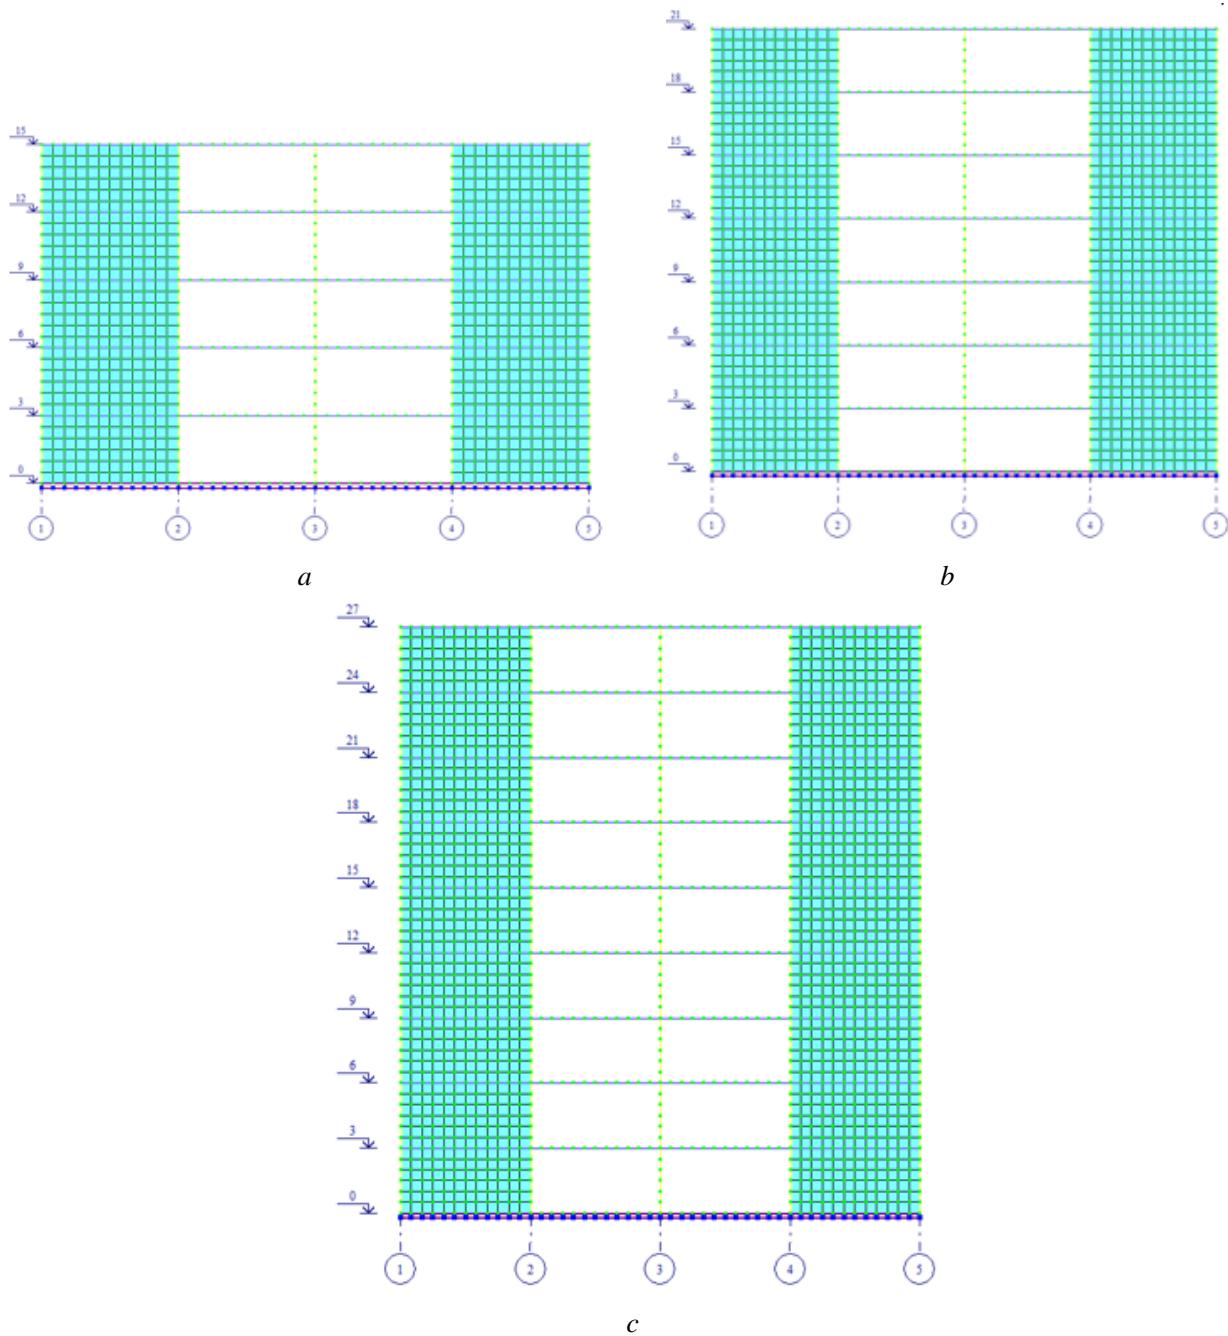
Five-story (a), seven-story (b) and nine-story (c) building sections with "D" axis
